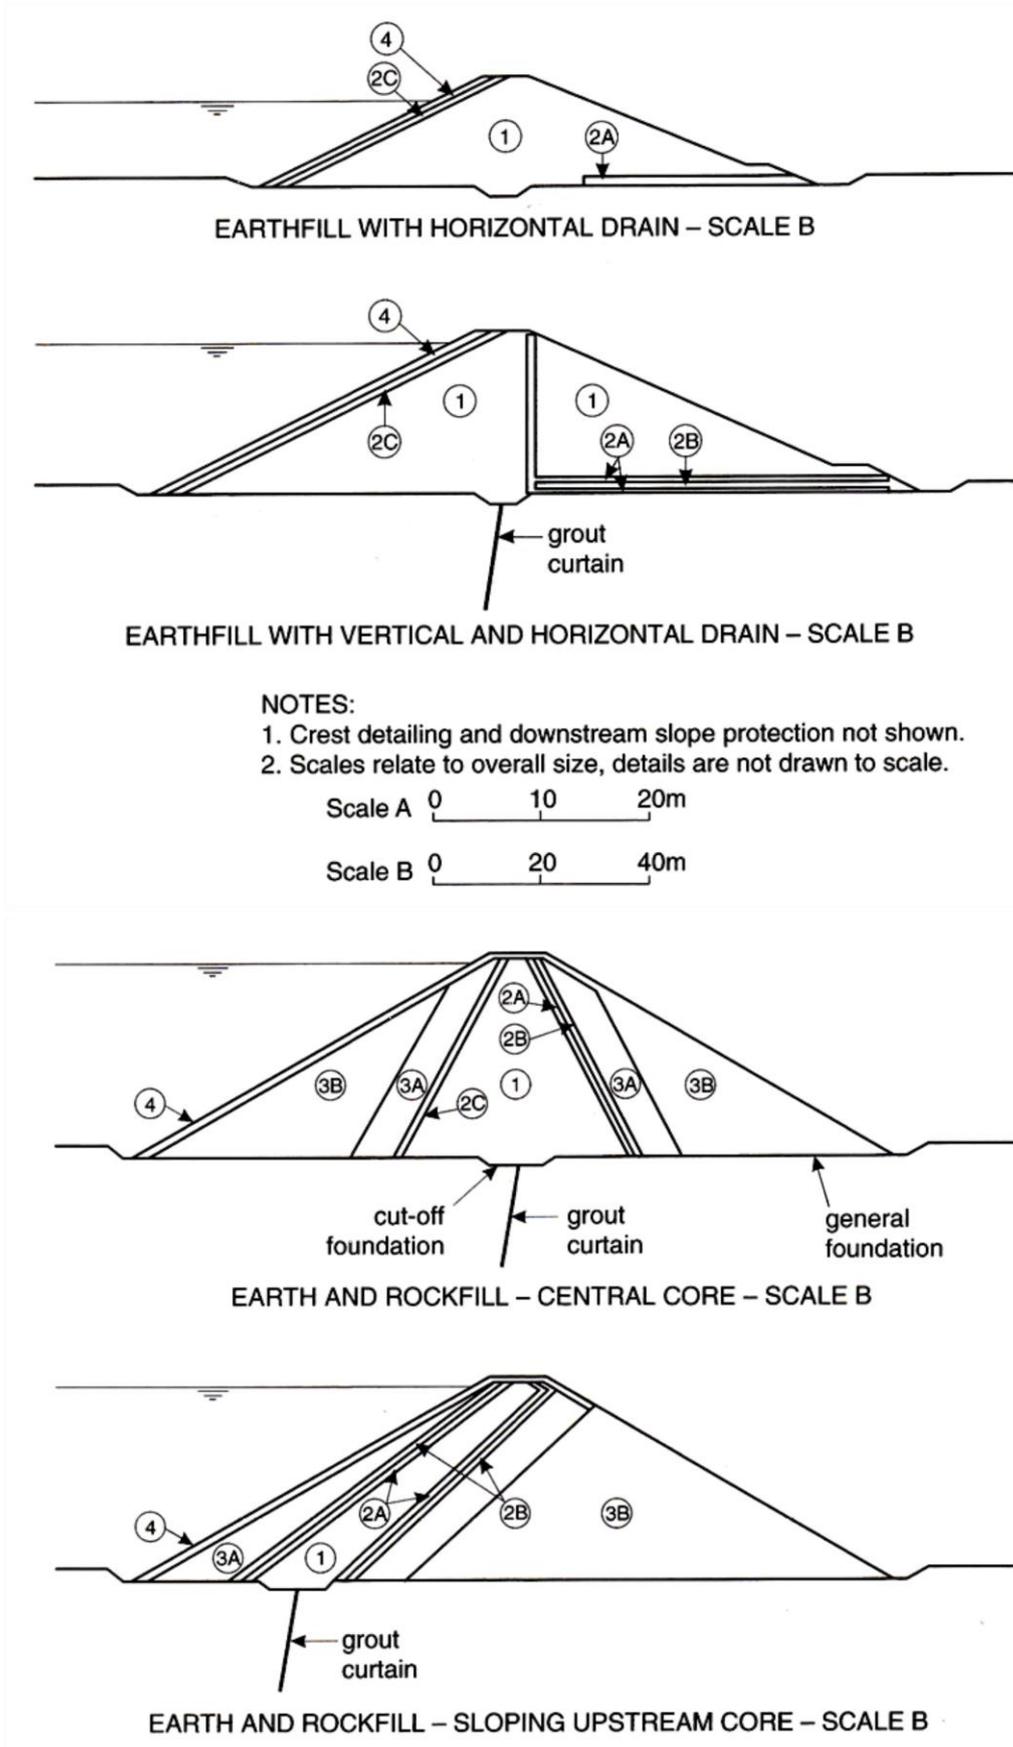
(II): Typical embankment dam structures (Fell et al., 2015)
